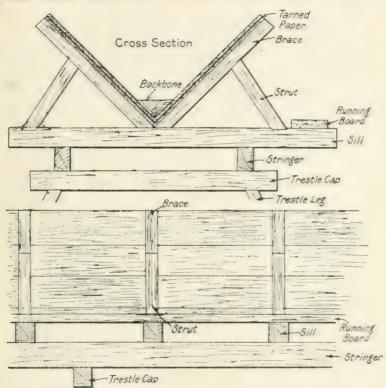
LOG FLUME. SIDE ELEVATION AND CROSS SECTION. SCALE & inch = I foot.
